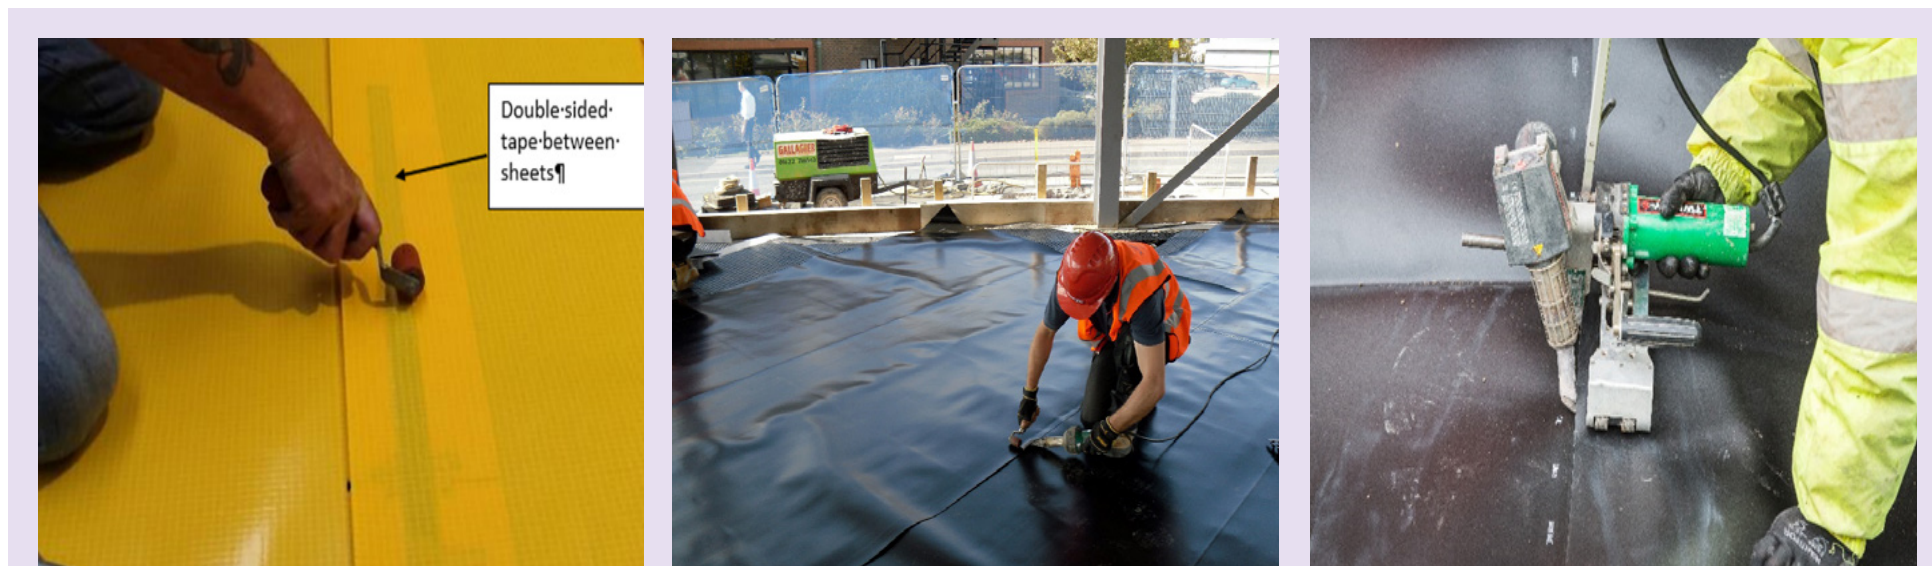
Correct installation of a seams by applying pressure (left) taped seam, (middle) heat sealed seam, (right) welded seam with twin wedge machine
